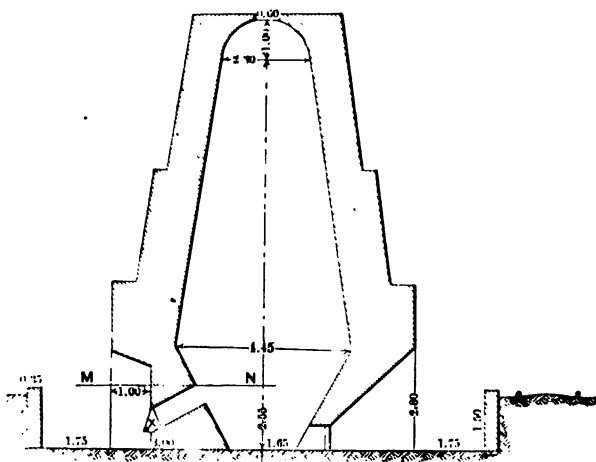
Vertical Section of a Transformed Lime Kiln.
